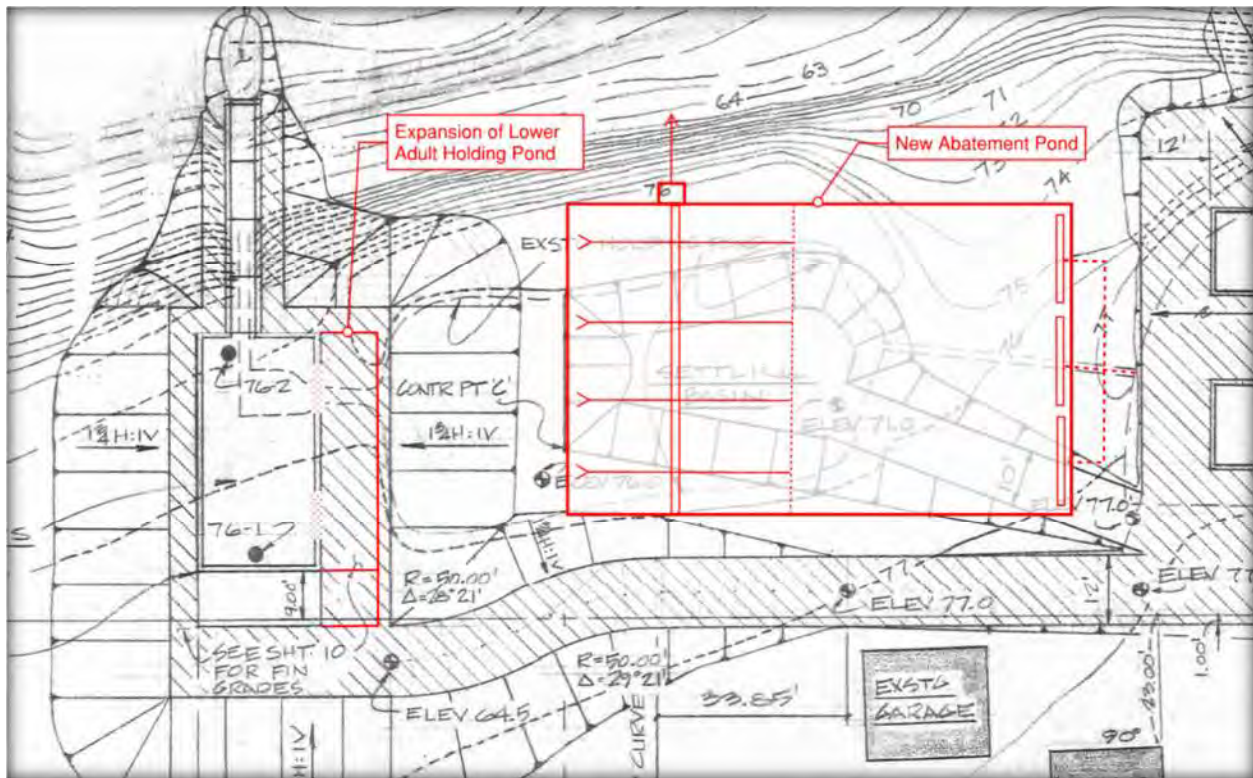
Trask – Proposed Layout -Abatement Pond and Lower Adult Holding Pond
